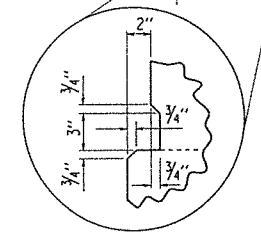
DETAILS OF OPTIONAL SLIPFORMING OF CONCRETE PARAPET RAIL (OPEN OR CLOSED)
